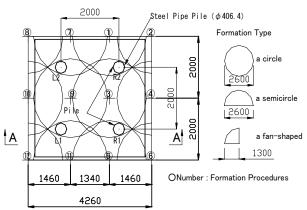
Reinforcement body cross-section (1-1') And formation procedures
